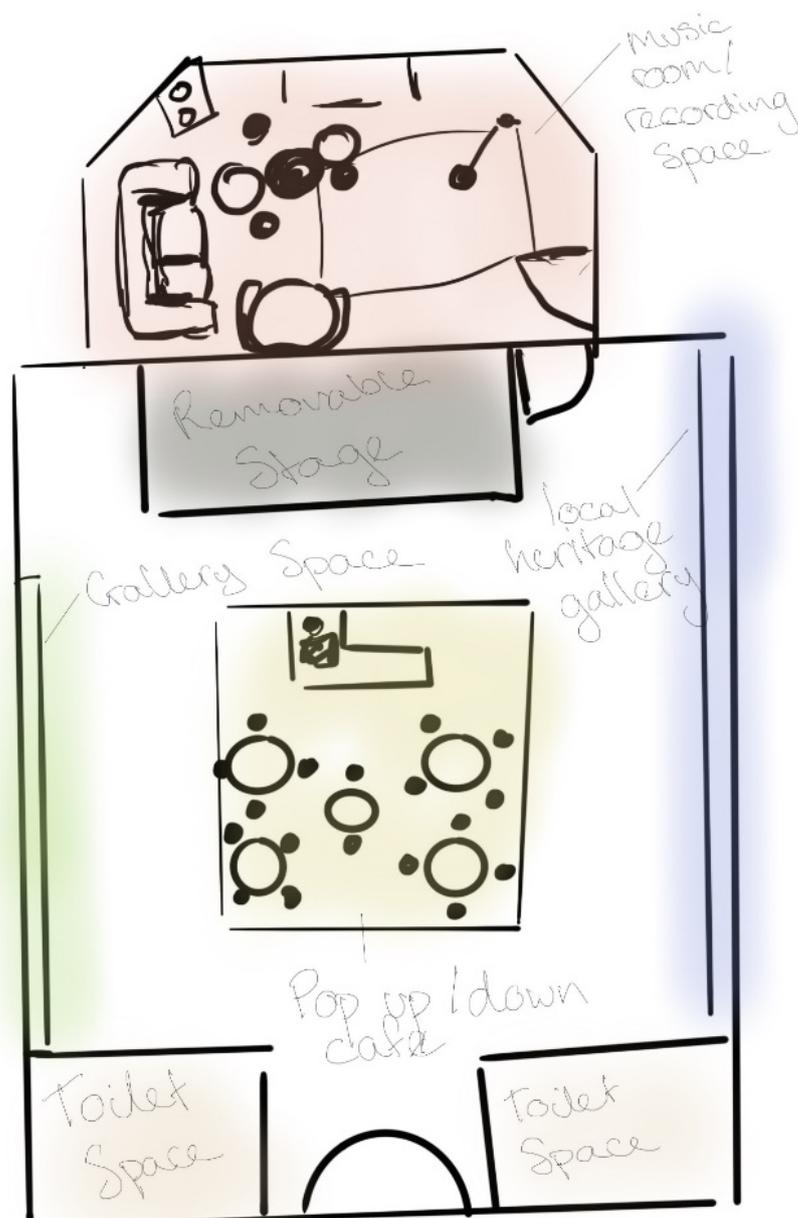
Plan of inside Fasnakyle Church design fiction
